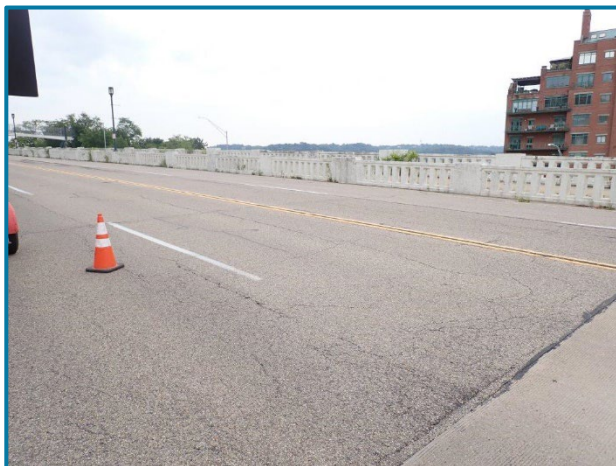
Wide map and random cracking in the approach pavement (East Approach, looking southeast).
